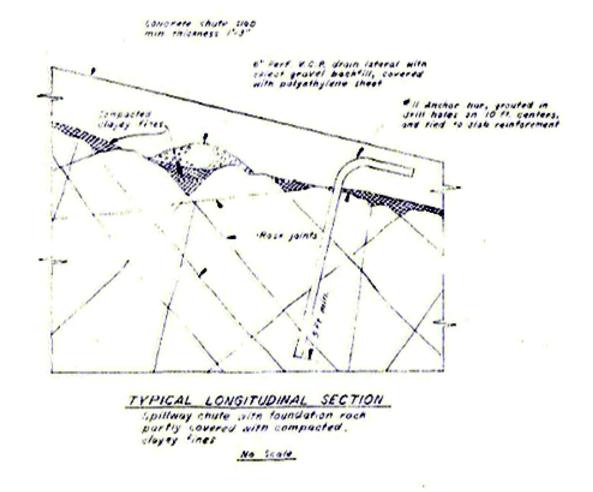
Spillway Chute Slab Foundation and Drainage Details
